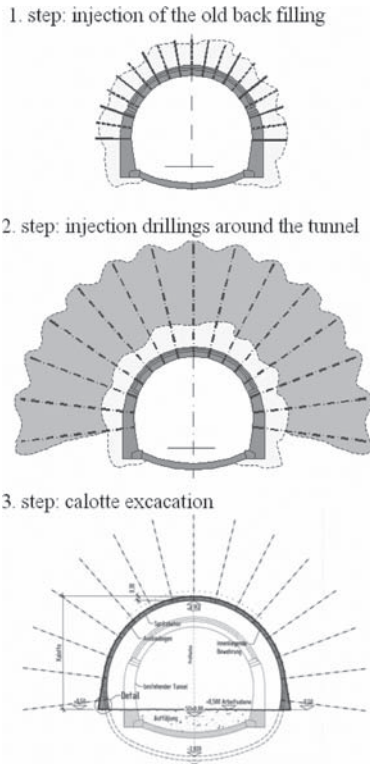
Tunnelling technique—Old Tunnel Mainz.
